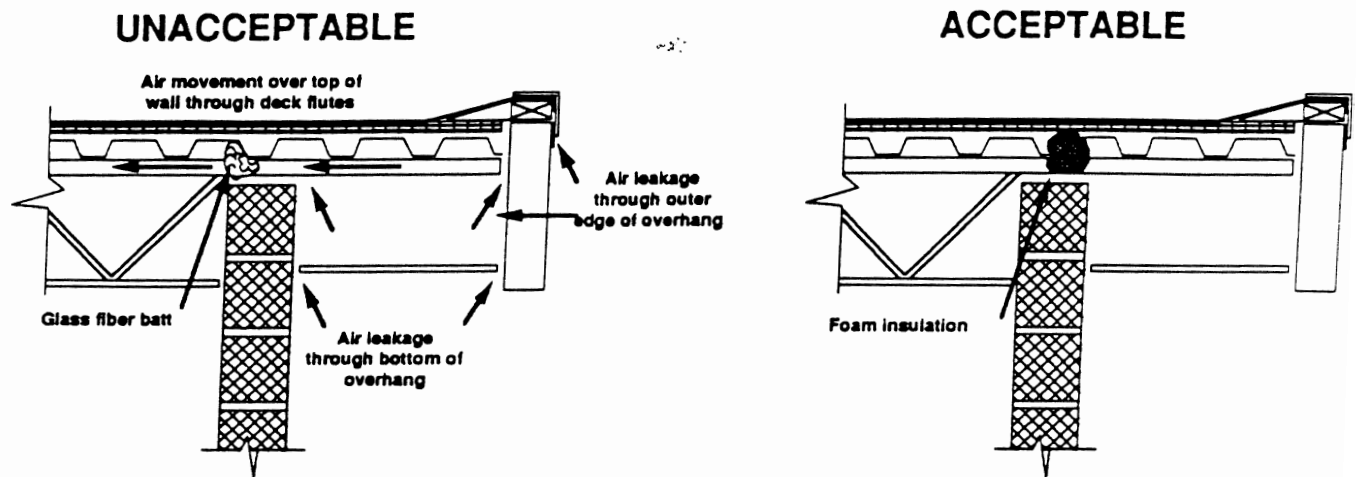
Air Leakage at Roof Overhang (Riedel)
